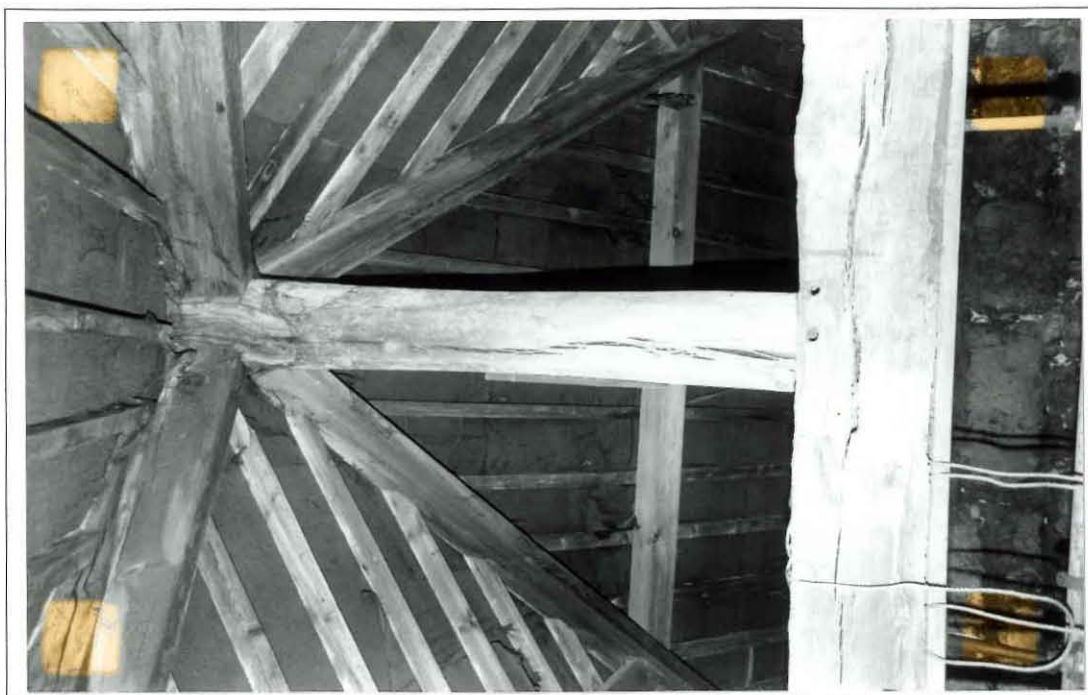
Bell tower roof interior showing king post and tie-beam. Photo CPAT 956.31
